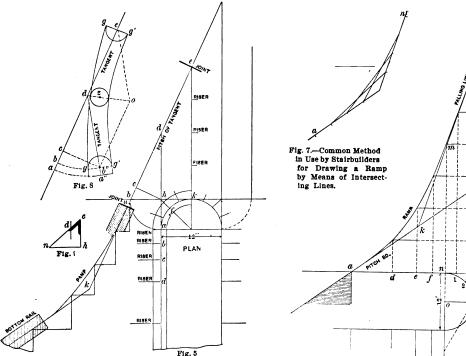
Plan of Stairway Having a 12-Inch Cylinder Between
